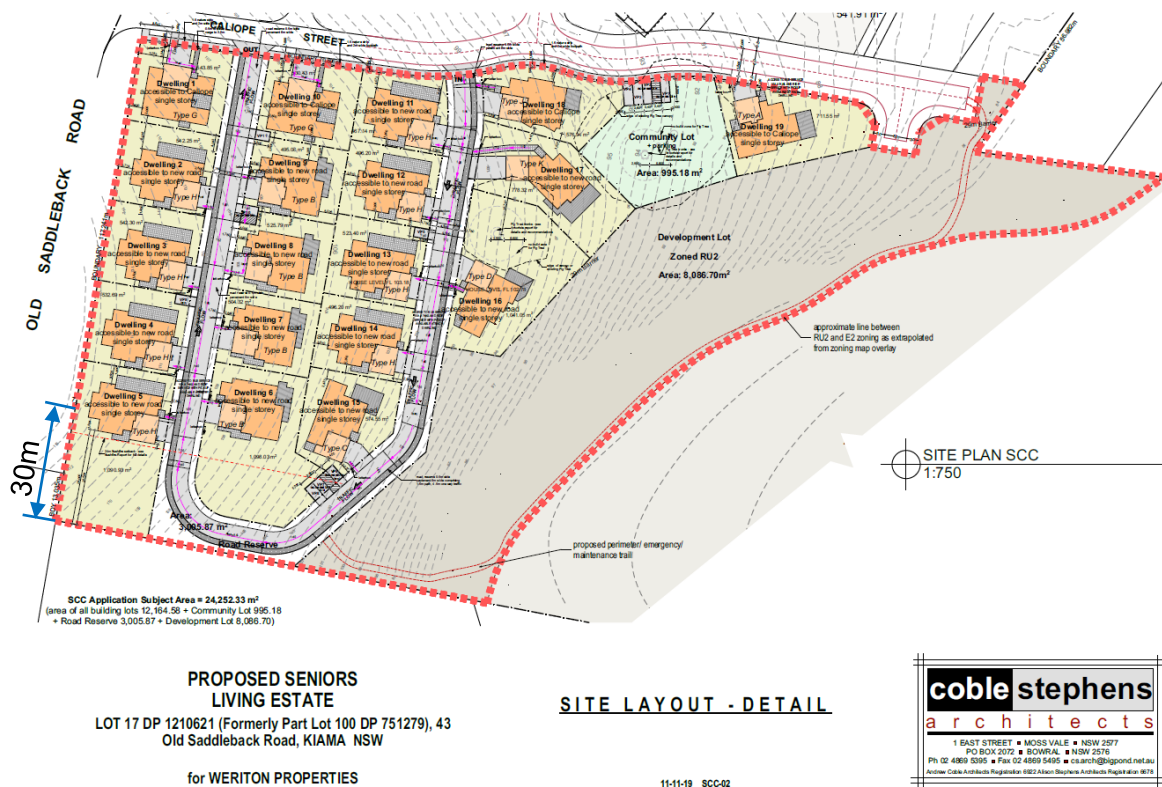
Site layout plan (Coble Stephens Architects 2019) with approximate length of western boundary fence superimposed
